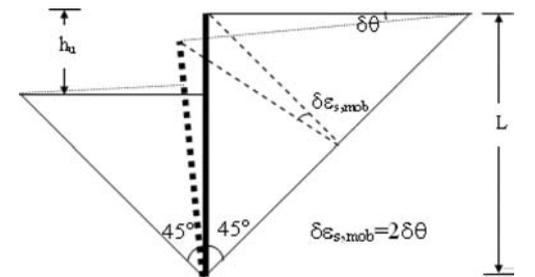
Plastic deformation mechanism for cantilever retaining walls in undrained conditions.
